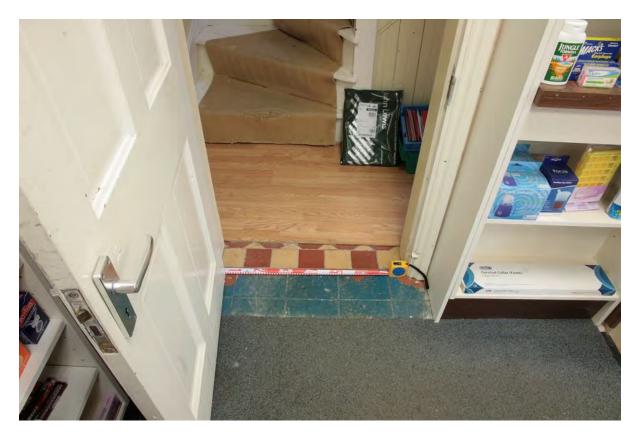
Original floor tiling in Sales Floor area, looking north-east (LMSC16 D100 (51))
